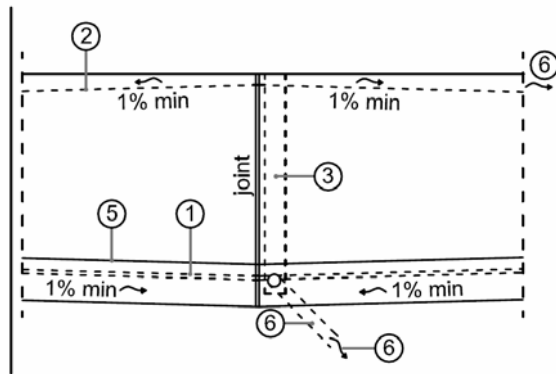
Longitudinal profile of drainage of the wall rear (1 perforated concrete pipe, 2 concrete gutter or channel, 3 inspection shaft, 4 concrete pipe of  $d_{min} = 30$  cm, 5 ground surface, 6 connection to sewer)
